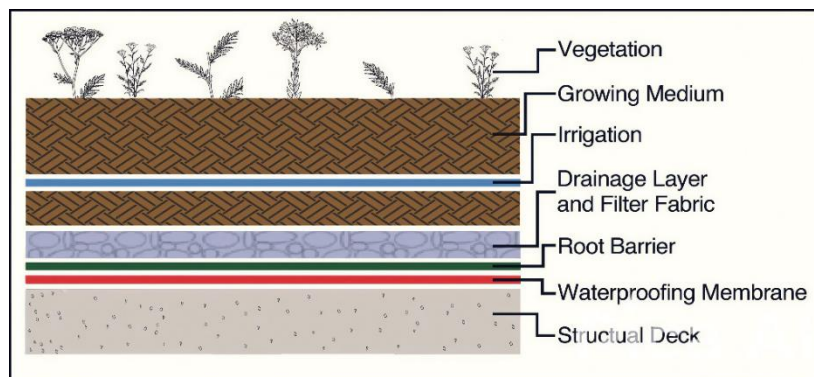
shows: A green roof section, showing the layers of a green roof. This section shows an optional irrigation system.[38]
